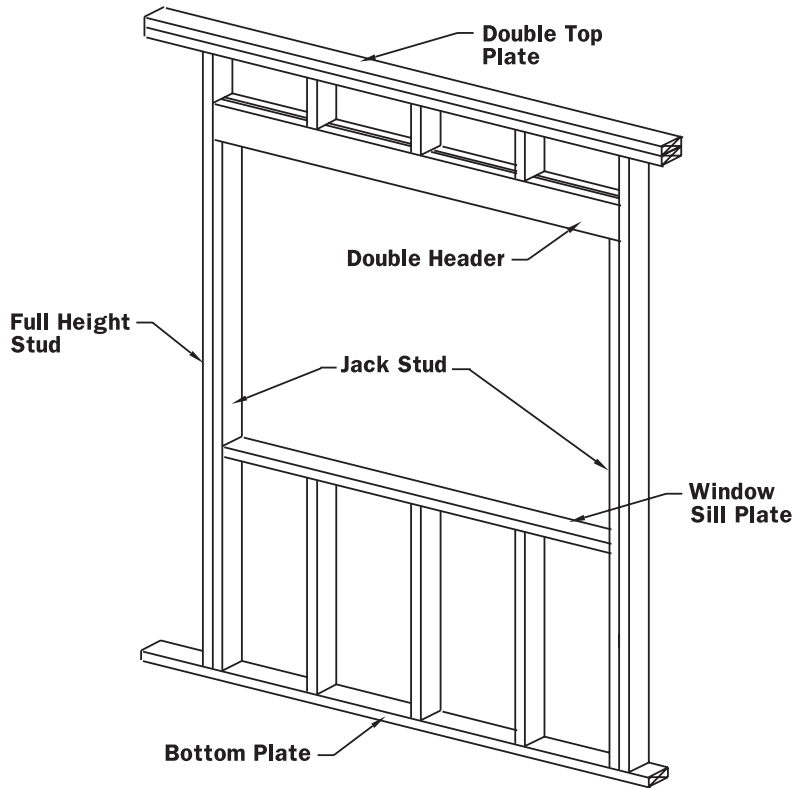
Studs and Headers Around Wall Openings - Bay Window
